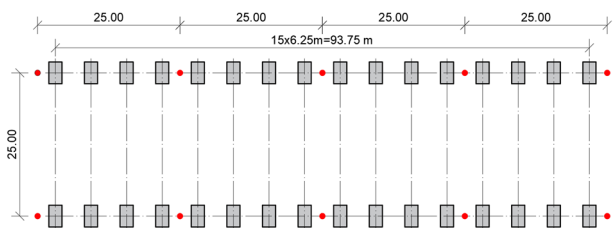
Simplified layout of pile caps (grey) and CPTs (red)
